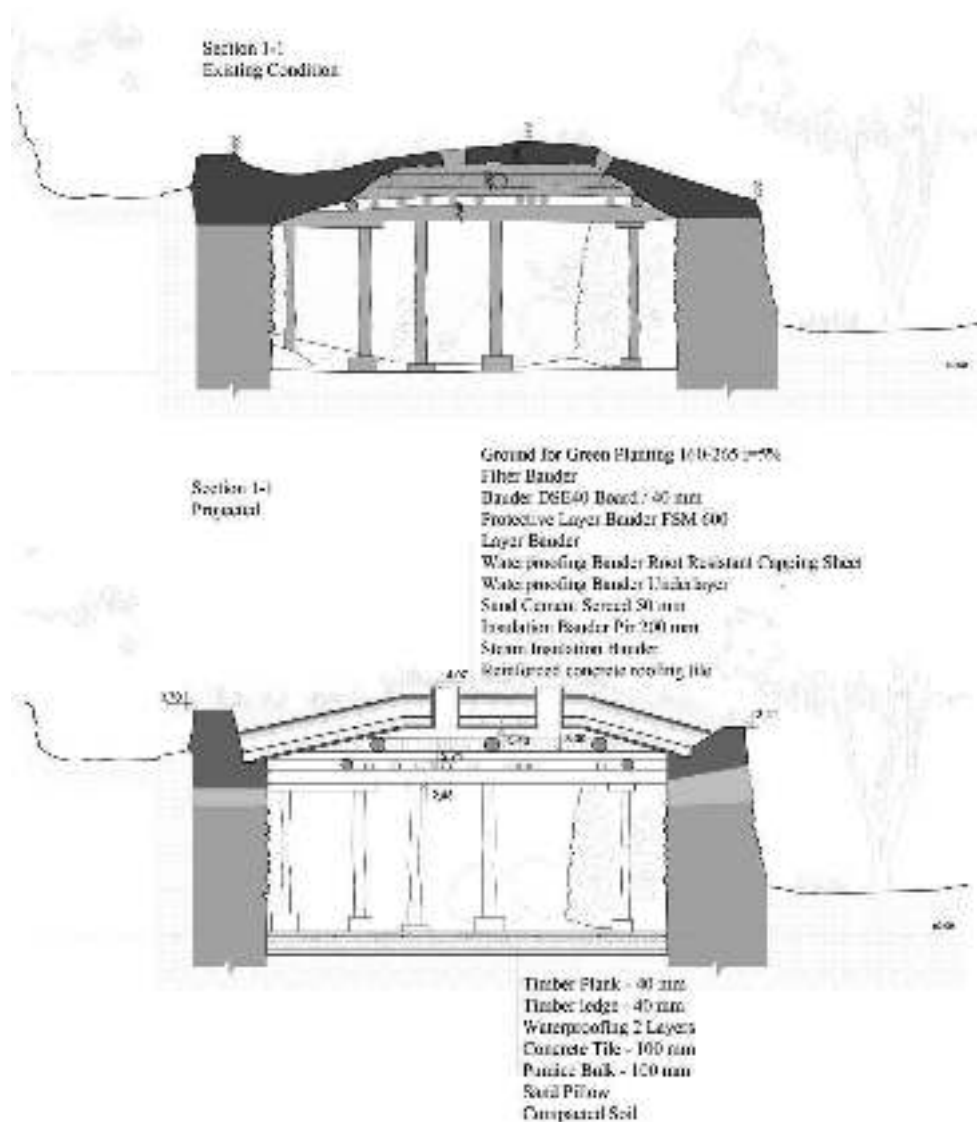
Tchatchkari. Sections of the building, existing and planned conditions
